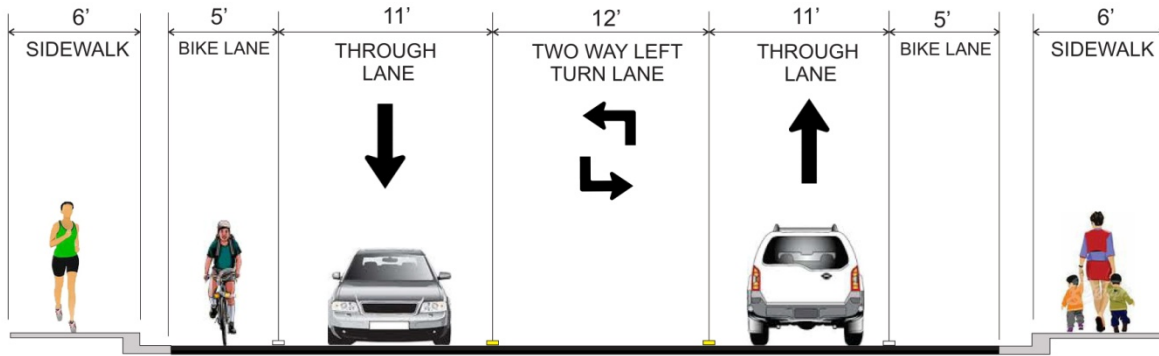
Road Diet Roadway Section – 4 Lanes Reduced to 3 Lanes
